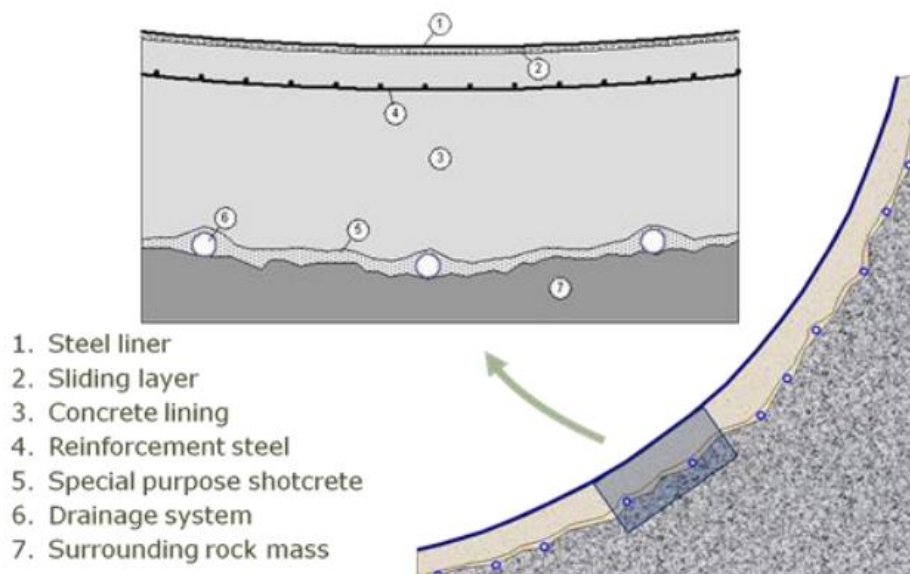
Lined Rock Cavern (LRC) wall sections (Tengborg, Johansson, & Durup, 2014)
